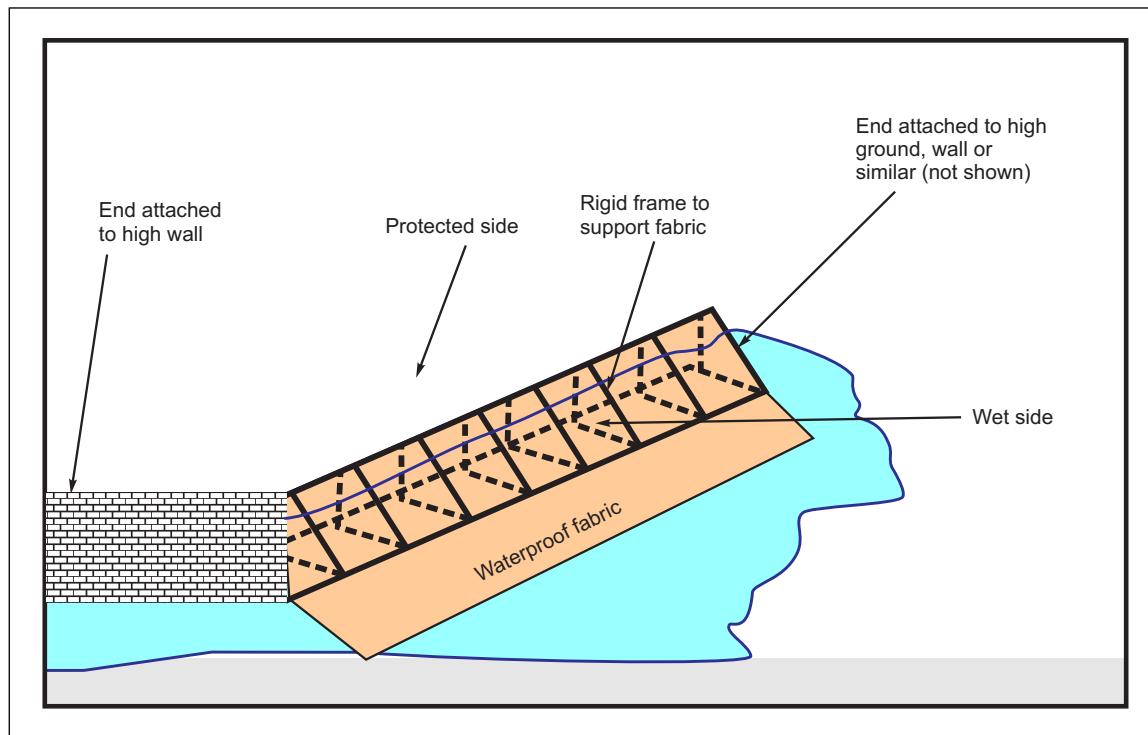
Waterproof fabric cofferdams with rigid frame
